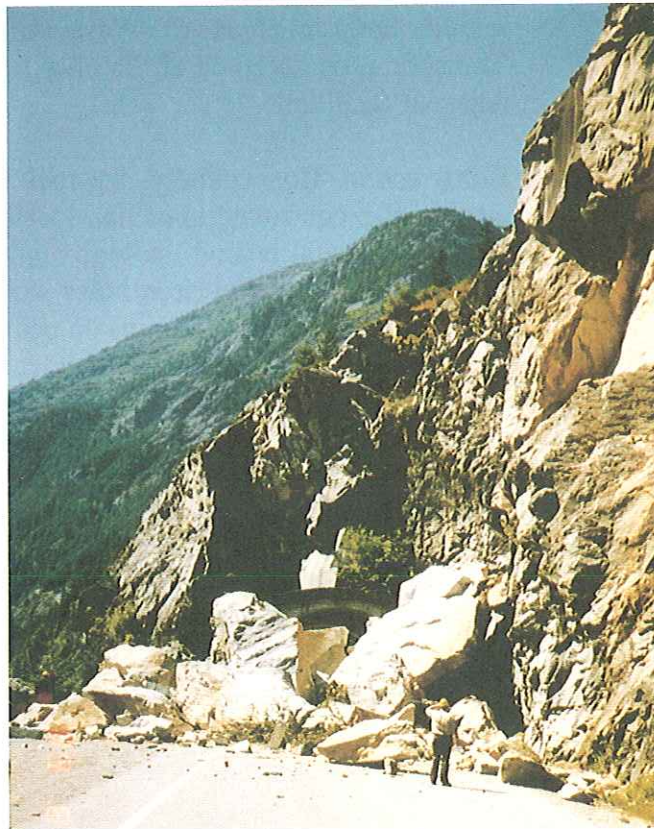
Large rockfall at the tunnel portal about 4 miles (26km) east of Newhalem, Washington completely blocks the highway (Courtesy Washington Department of Transportation).
